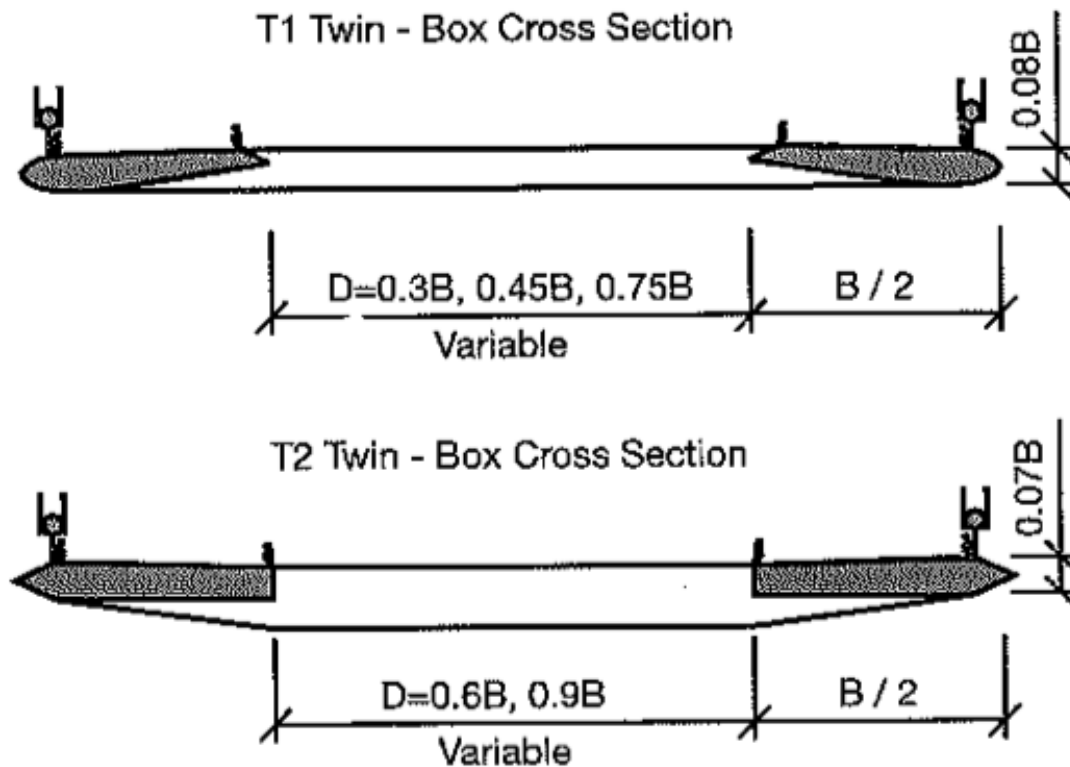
The two girder sections that was tested in the wind tunnel. The second girder section, T2, was selected for further tests (Larsen & Esdahl, 1998).
